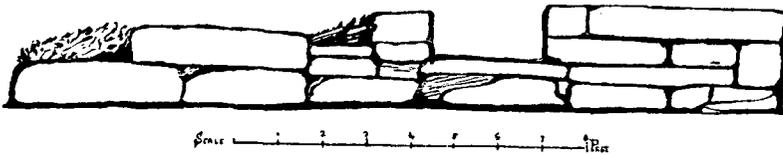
Sectional Elevation of South Wall of Doorway, showing Entrance to Guard Chamber.
